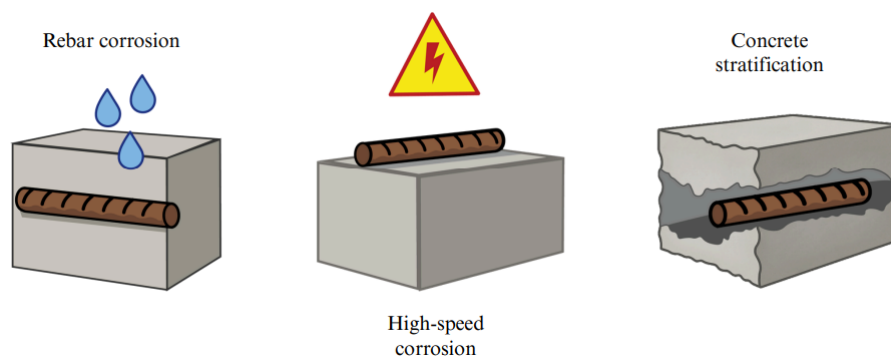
Visualization of corrosion mechanisms affecting reinforcement in concrete structures (author's material)
